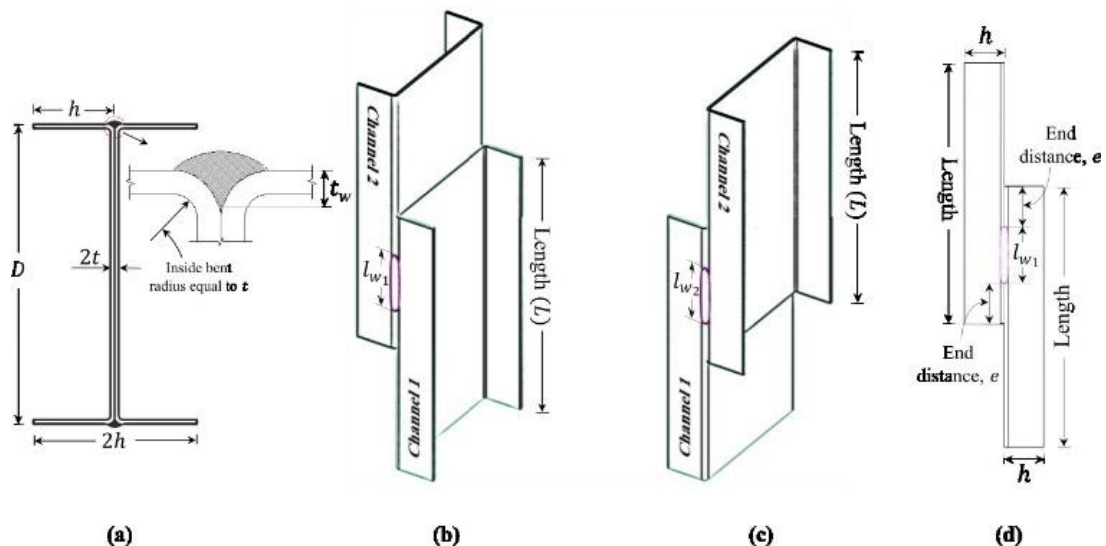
(a) Cross-section of lap shear specimen; (b) View showing the top side of the welding; (c) View showing the bottom side of the welding; (d) Front view of the top side of welding
